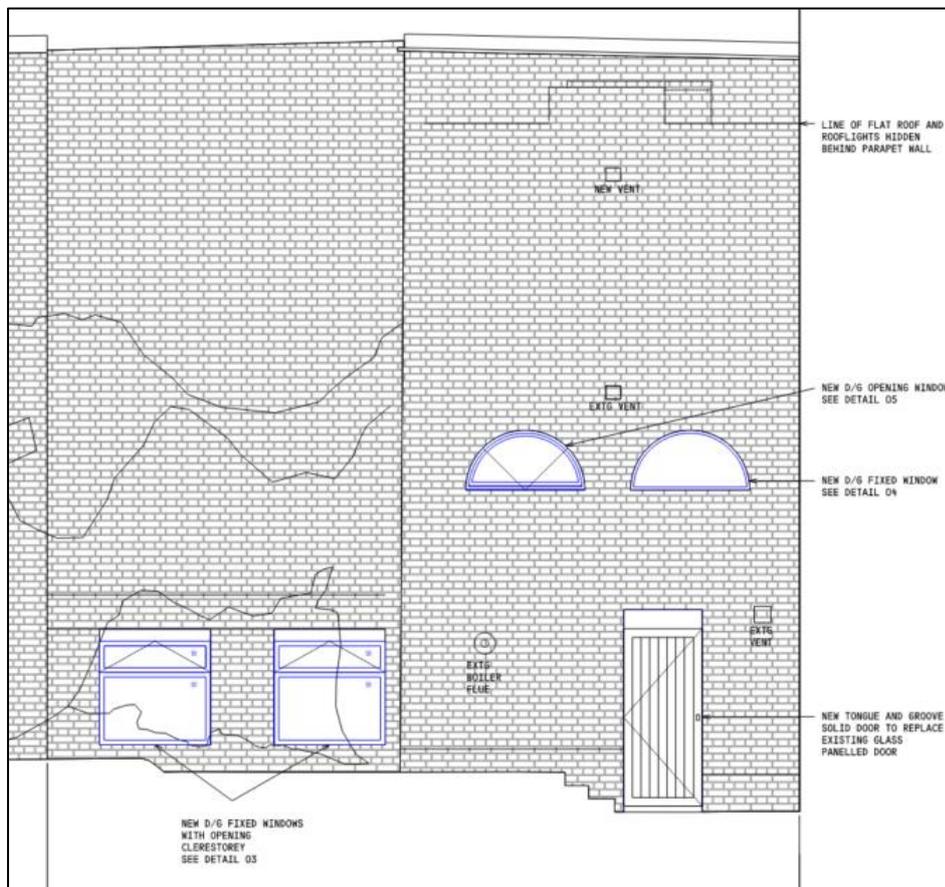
As-built rear elevation, indicating replacement windows in blue.
